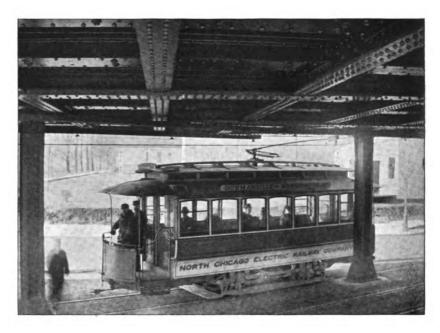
Electric Car Clearance and Under View of Bridge Floor at Lincoln Avenue.
